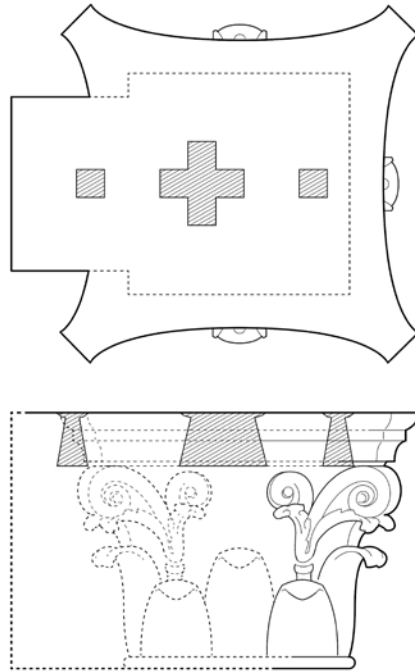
Plan and elevation of the pilaster capital by the authors
